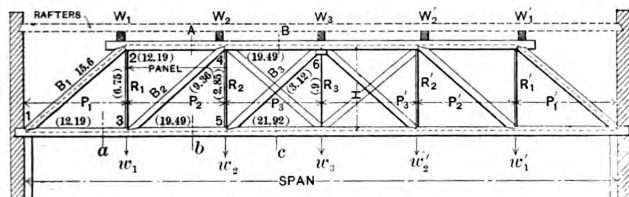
A Six-Panel Howe Truss, Showing Stresses.
